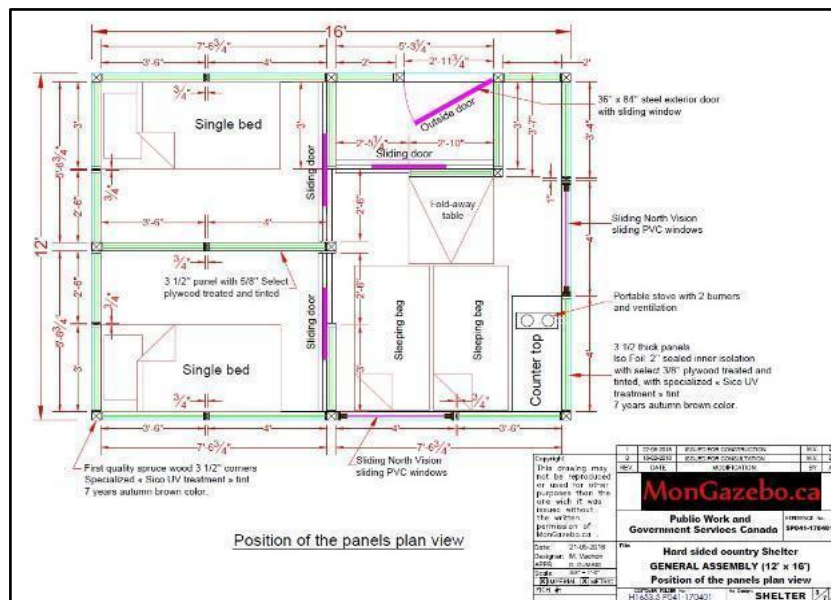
12'x16' multiuse cabin floorplan layout from manufacturer MonGazebo.
